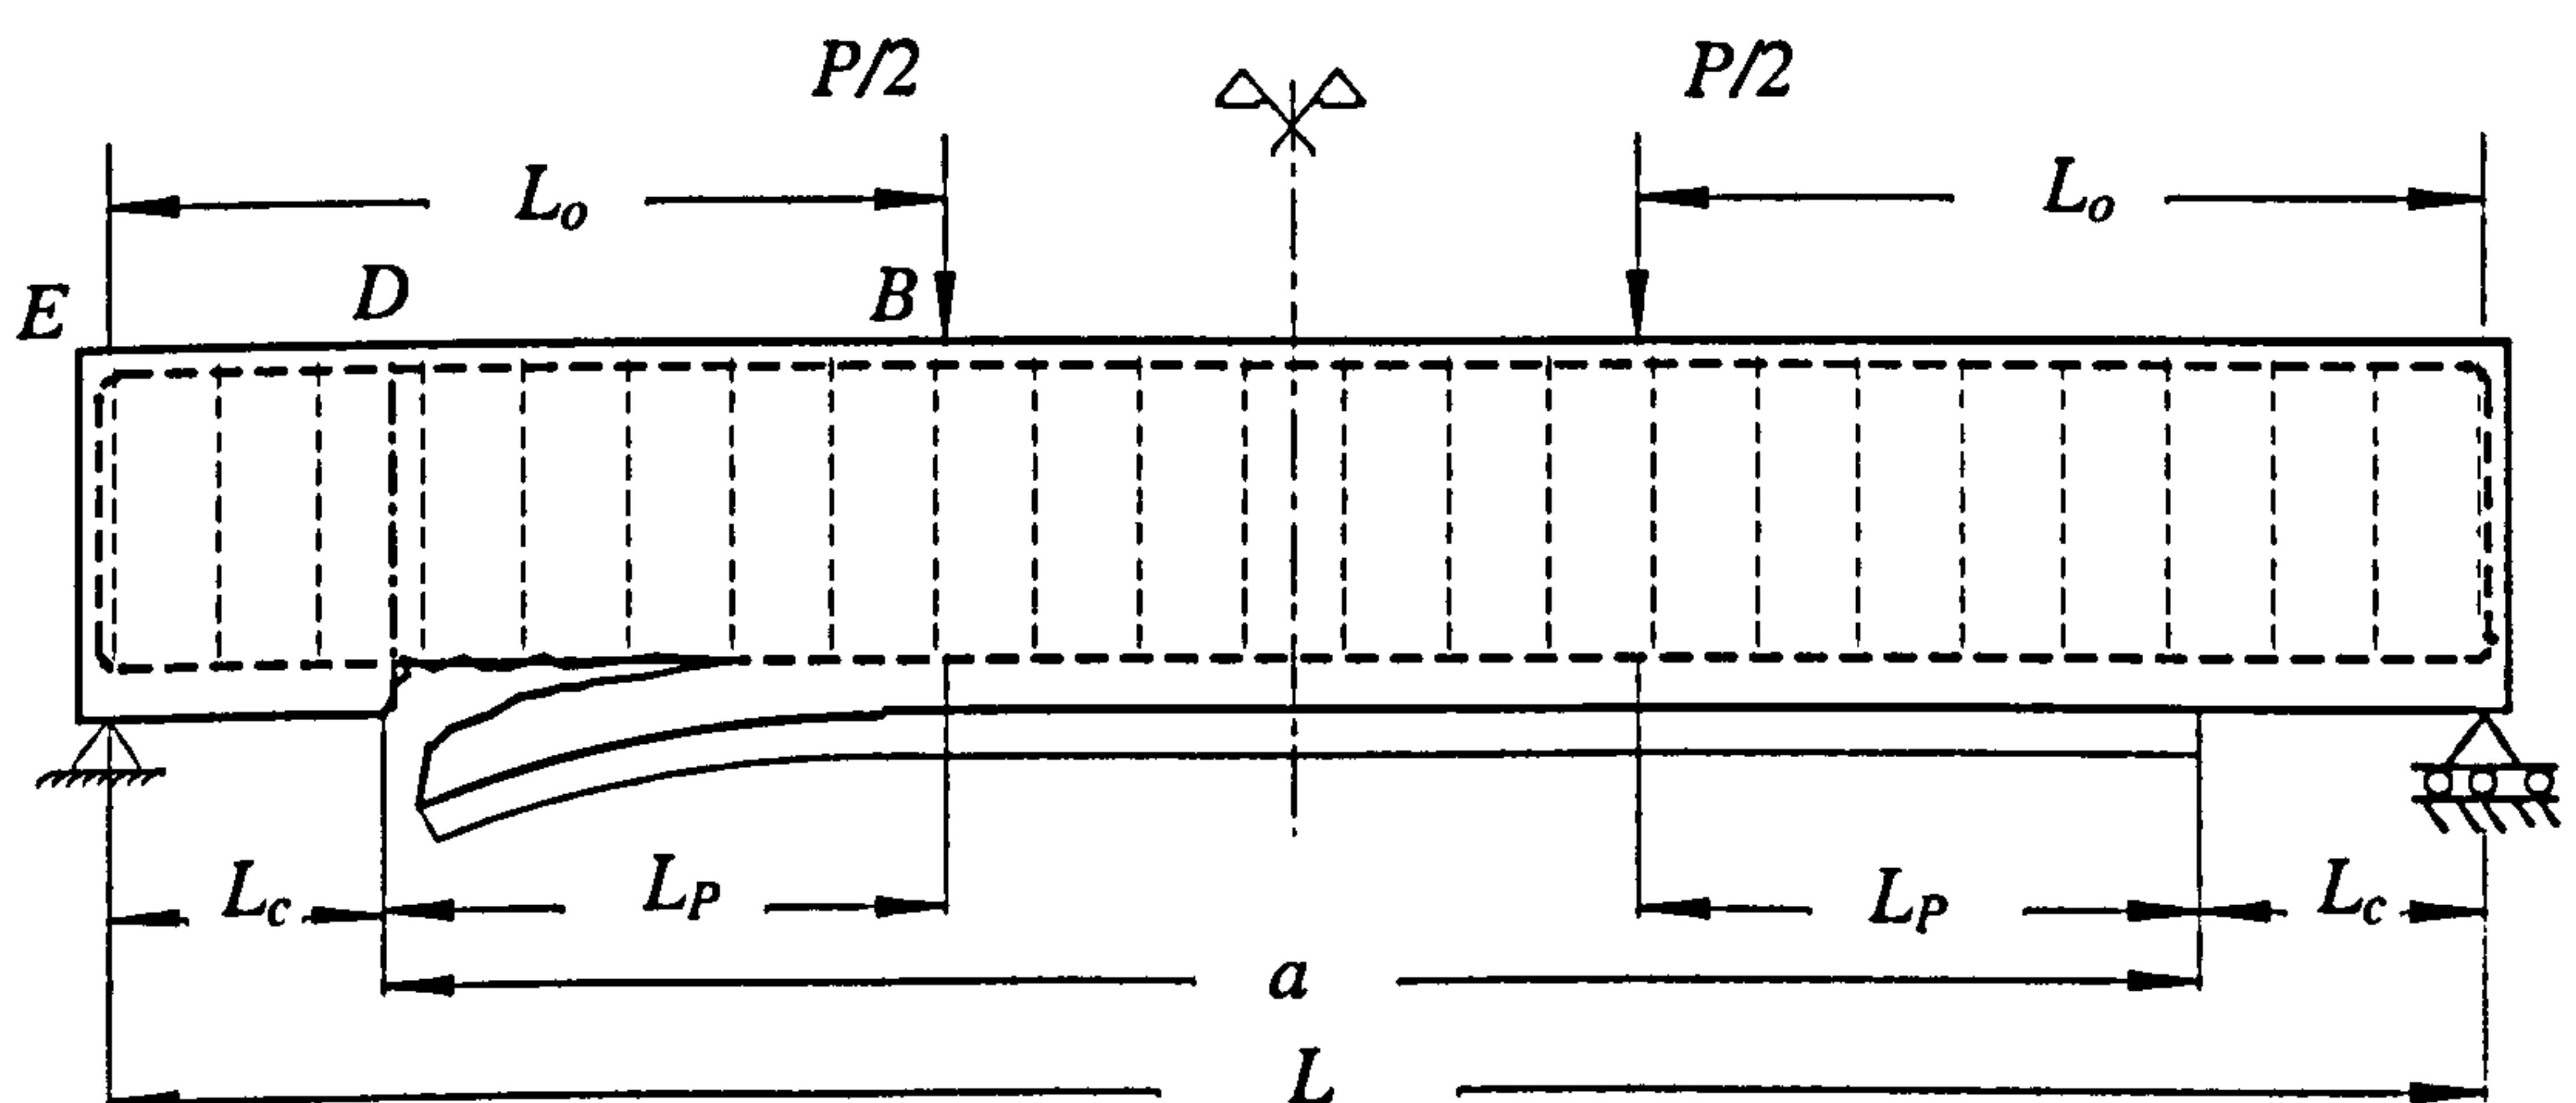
A typical plate peeling failure for a reinforced concrete beam upgraded with externally bonded plate.
